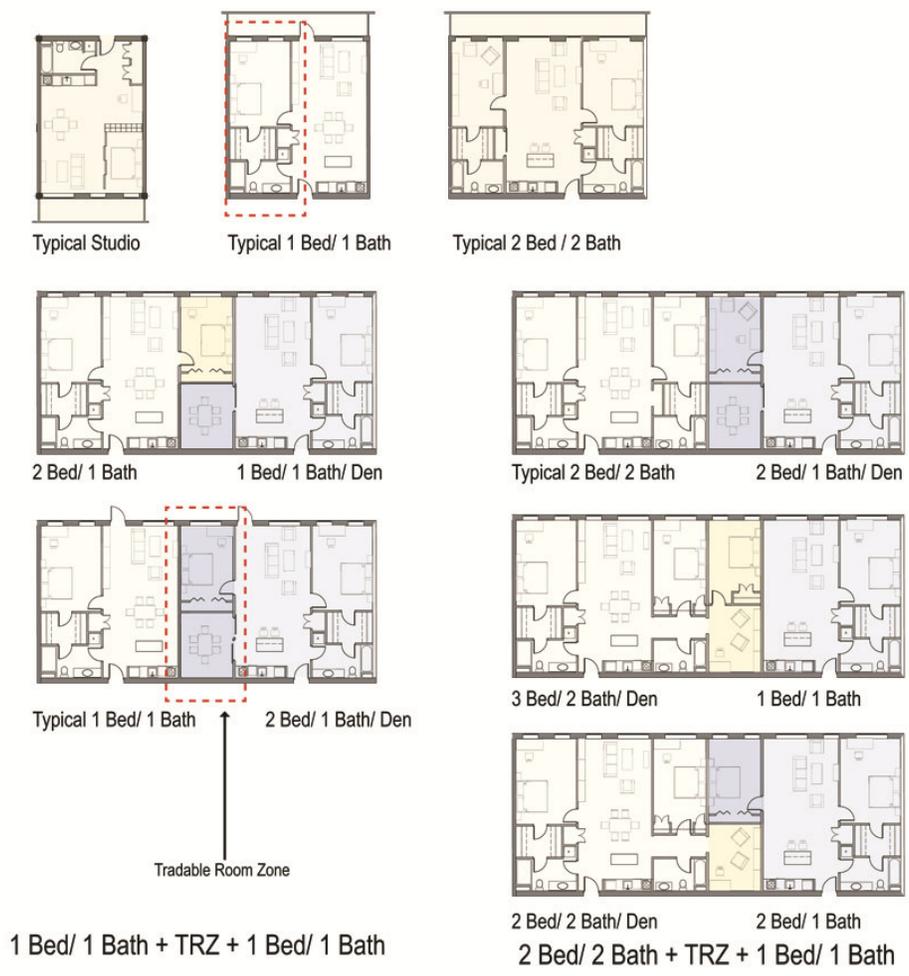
Unit Variation Diagram- The simple floor plans of units allow the “tradable room zones” to be easily traded between two units through creating new opening and closing the old openings.
